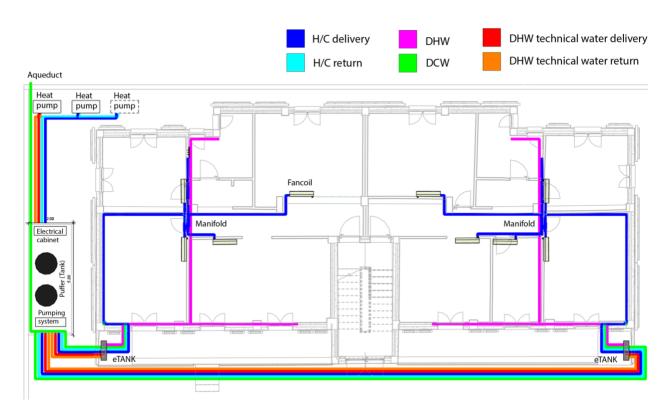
Pipe distribution from the cabinet to the internal units: plan view of a typical floor.
